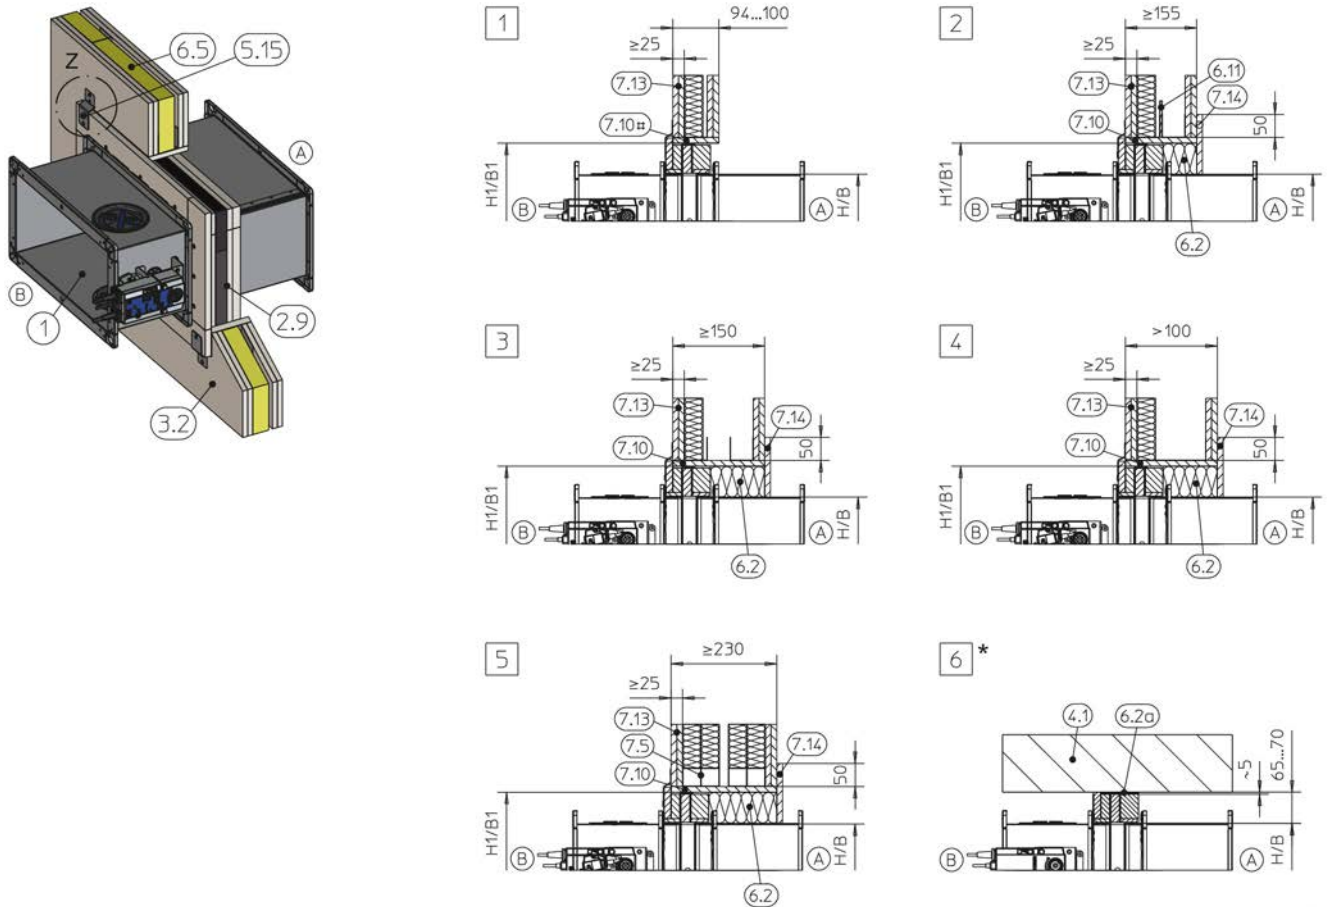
Mortar-based installation into a lightweight partition wall, below a flexible ceiling joint
